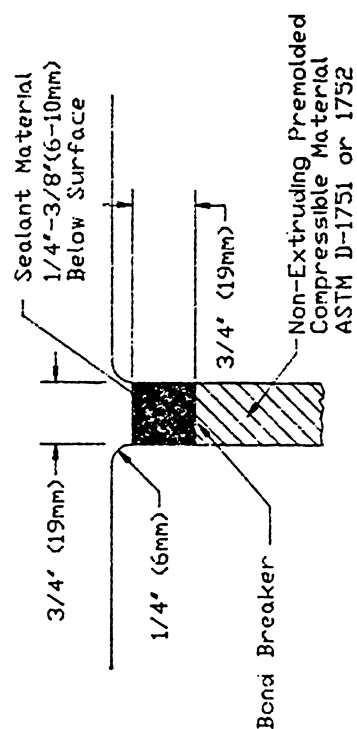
JOINTING DETAIL FOR LIGHT LOAD RIGID PAVEMENTS
